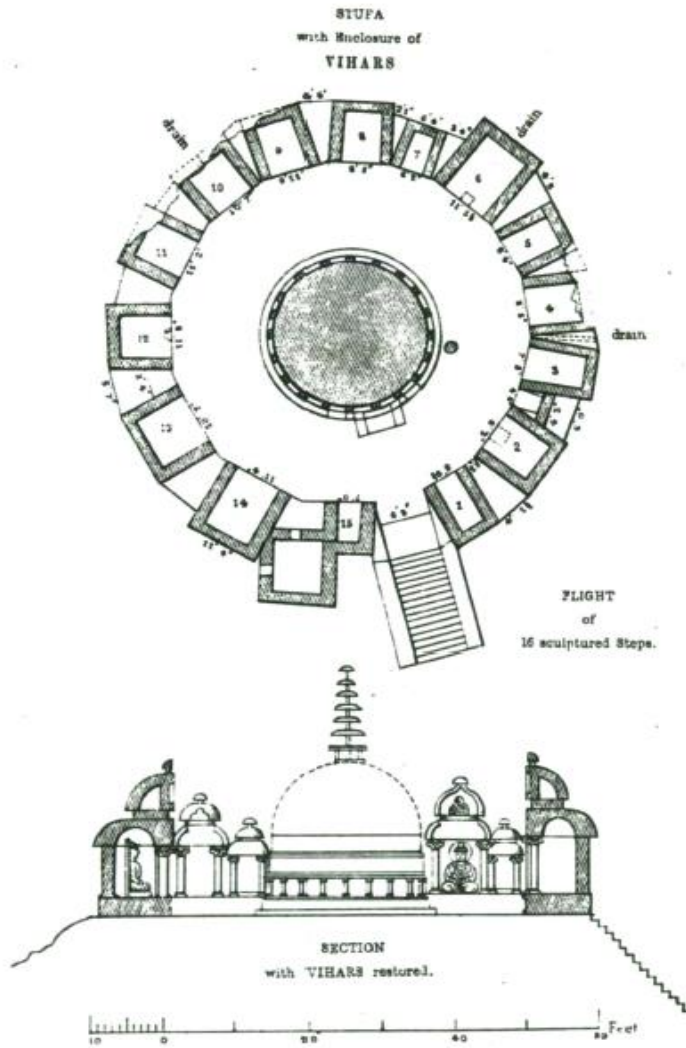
Main Stupa of Jamal Garhi (plan and elevation/cross-section)
